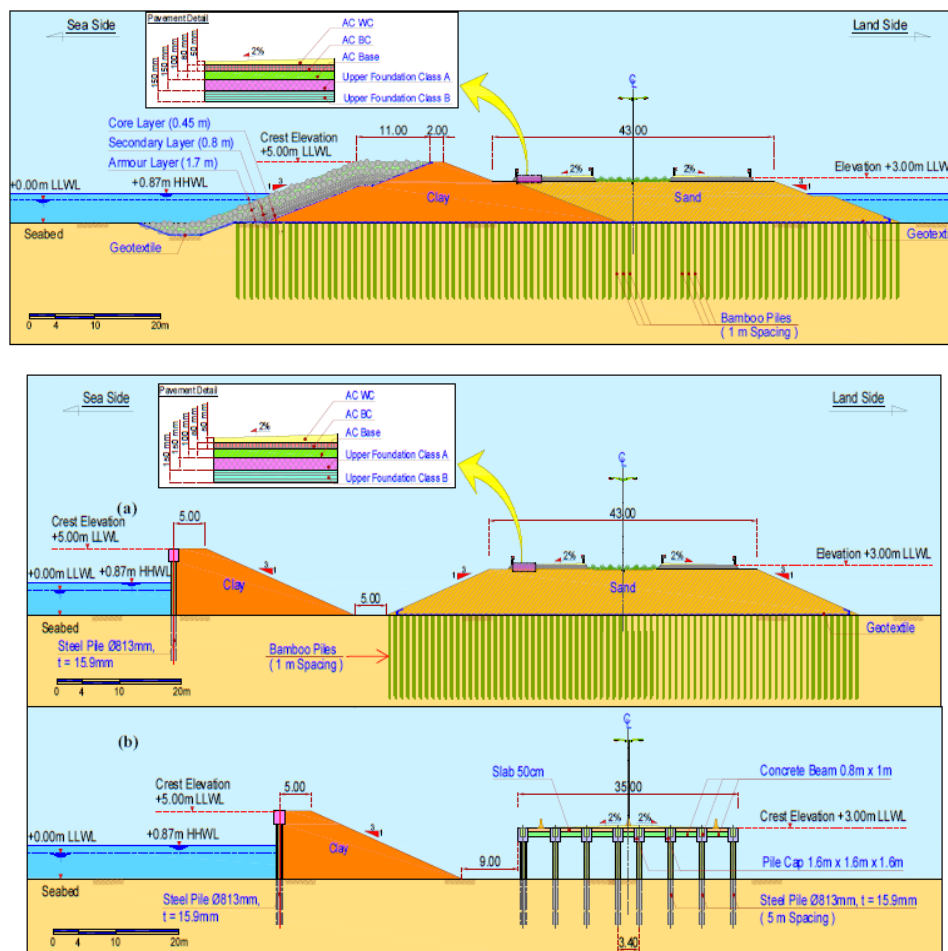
Seawall + road structure alternatives (design alternatives 1, 2, and 3 from above)
